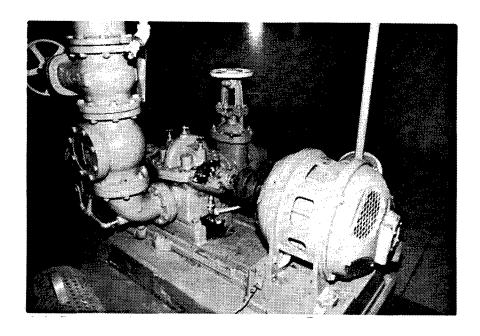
Building 400: Raw water pump manufactured in 1942 by Ingersoll-Rand and located on the first level. This electric pump is similar to the turbine-powered water pump also found in this building.
